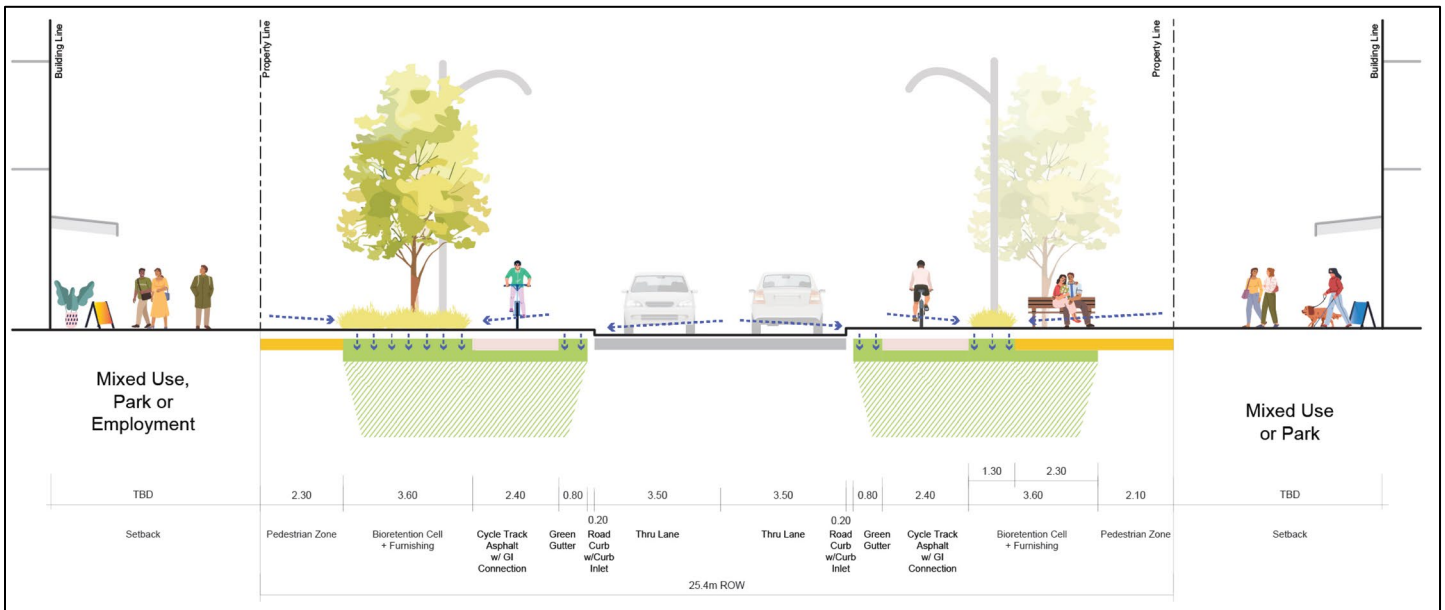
Dufferin Street (Northern Street to Sheppard Avenue West) Cross-Section - Option 5
